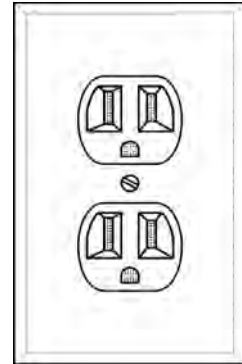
120-VOLT RECEPTACLE WITH INTACT COVER PLATE
